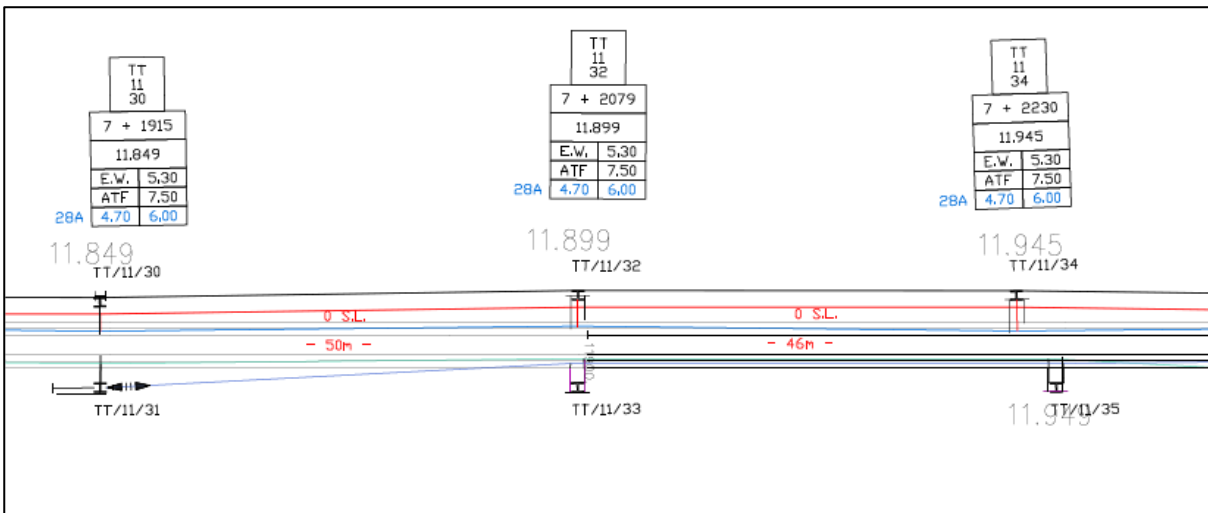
Extract from Old Dalby OCL layout plan (drawing 118049-FAF-REP-EOH-000015 (rev02))
